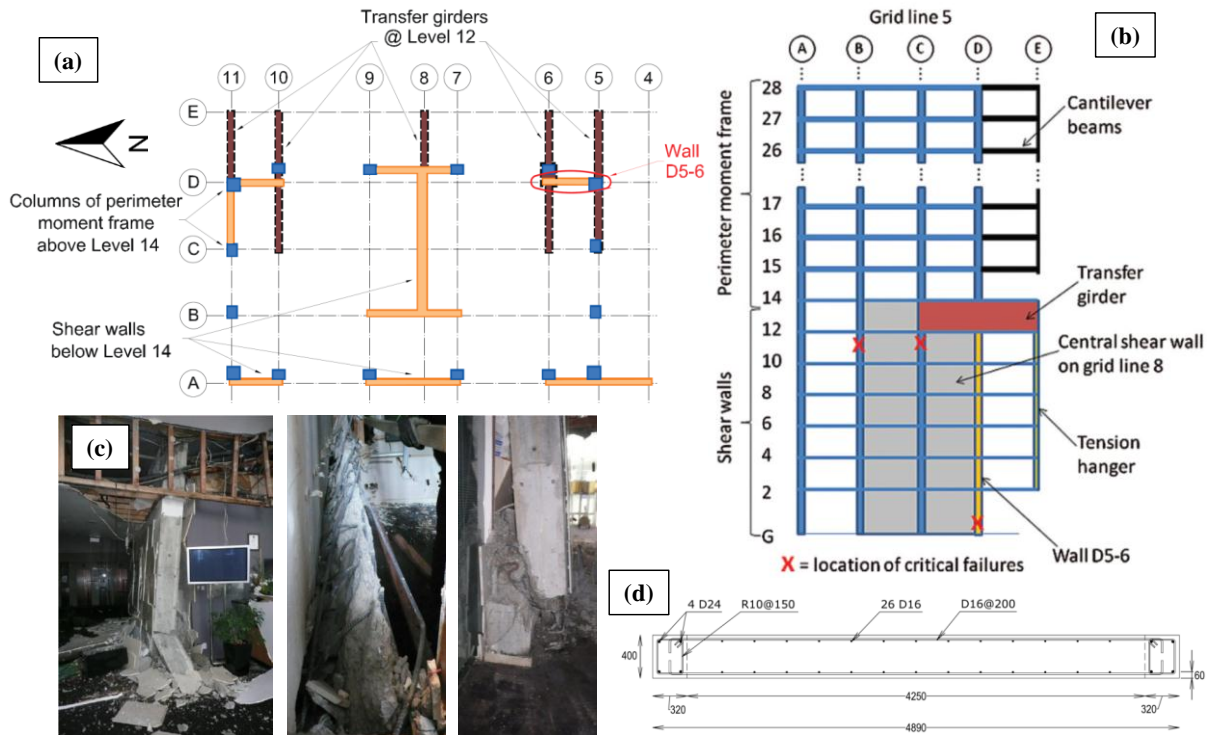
(a & b) GCH structural layout sketch plan and elevation along grid line 5 (Elwood 2013), (c) failure mode of wall D5-6 from GCH building in the 2011 NZ earthquake (Dunning Thornton 2011) and (d) details of the wall D 5-6 (Dunning Thornton 2011)
